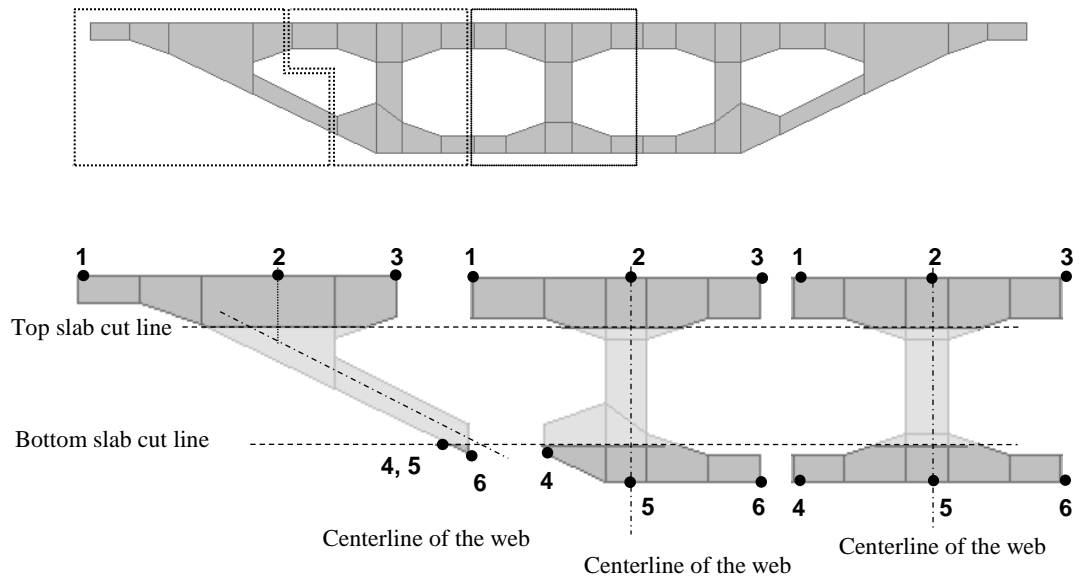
Bridge Concrete Box Deck Section - External Girders Sloped Max
